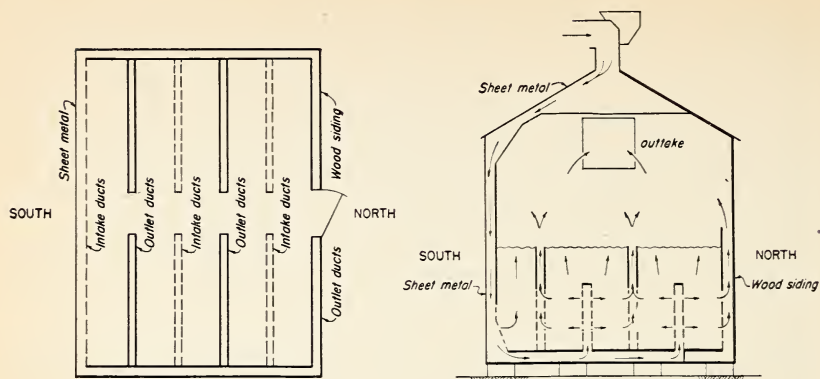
Plan and cross section of wooden bin shown in figure 13.
